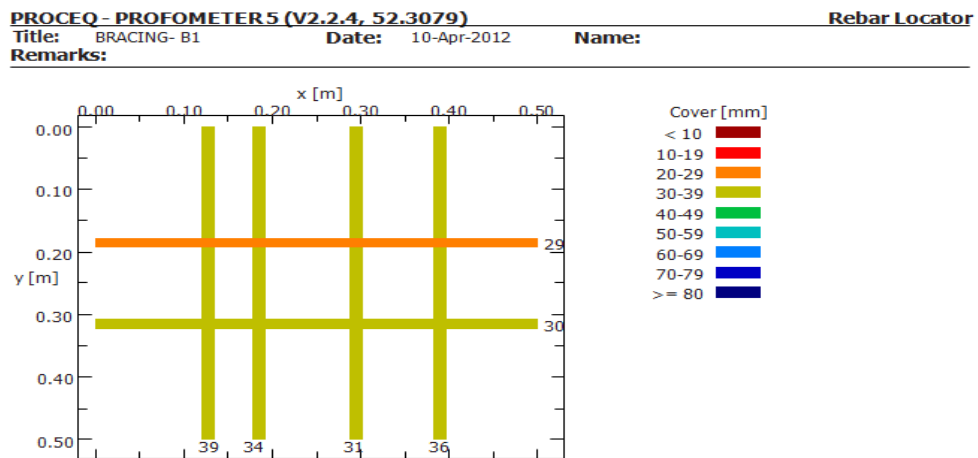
Results of Rebar Locator for Bracing B1, Building Rcc at Bhopal Karond
